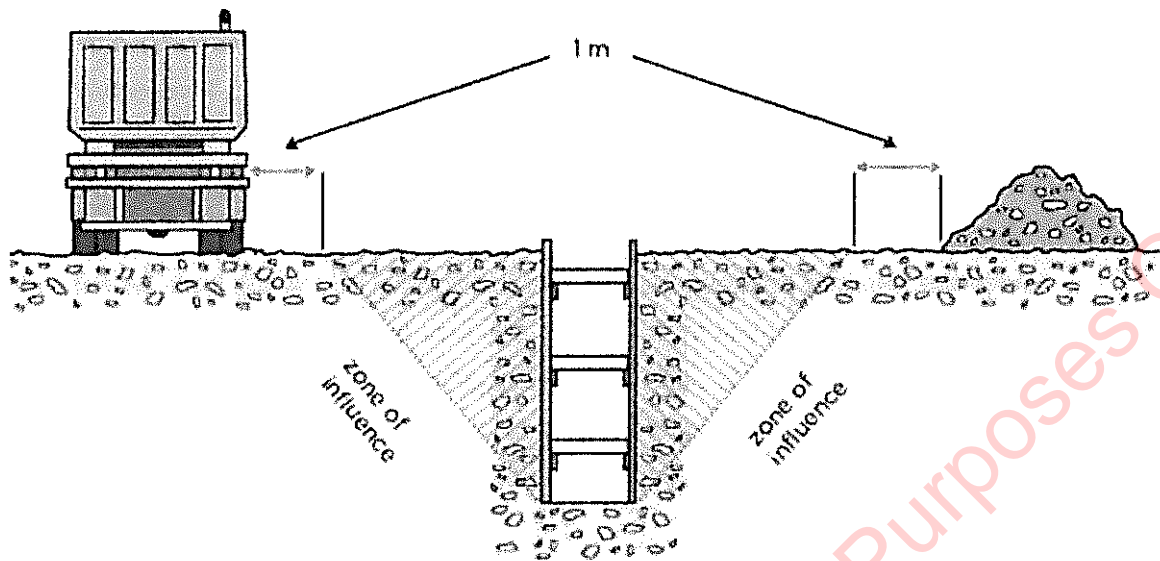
Examples impact of loading or surcharge on ground in proximity to open excavations.¹⁴
